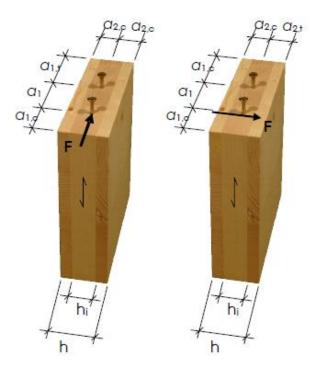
Definition of minimum spacings and distances for laterally loaded fasteners in the edge of cross laminated timber.
